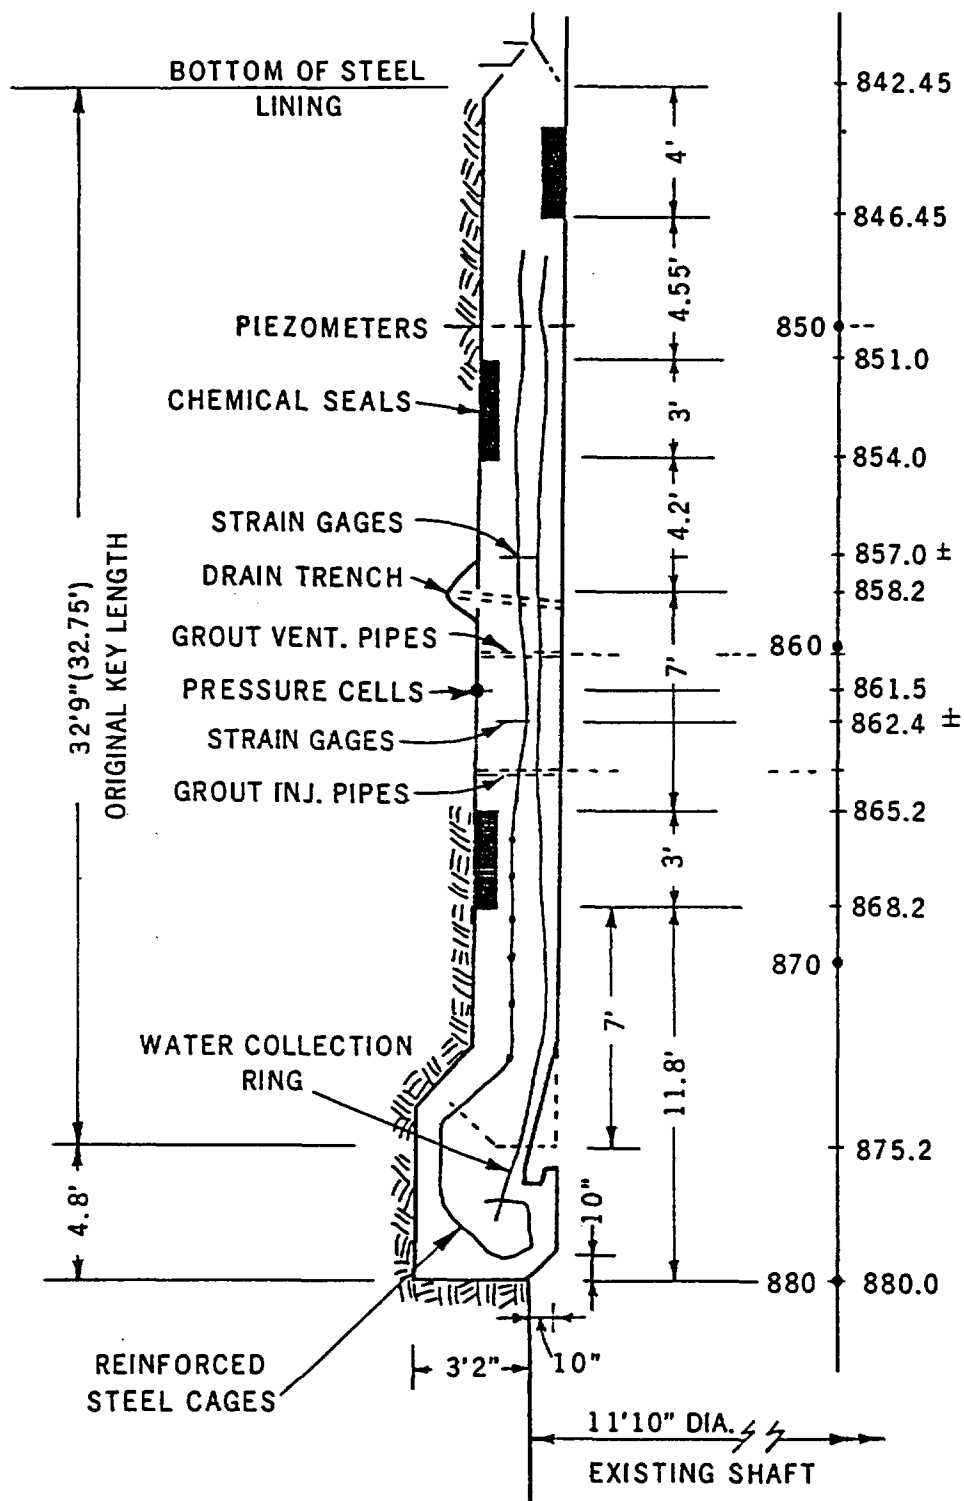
Shaft Key Construction and Seal Location, WIPP Construction and Salt Handling Shaft
